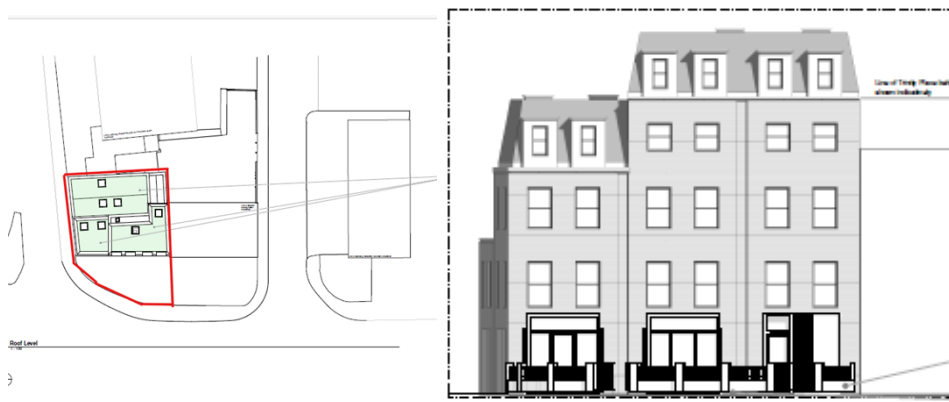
Proposed Site Layout (left); Proposed Elevation (Right)
